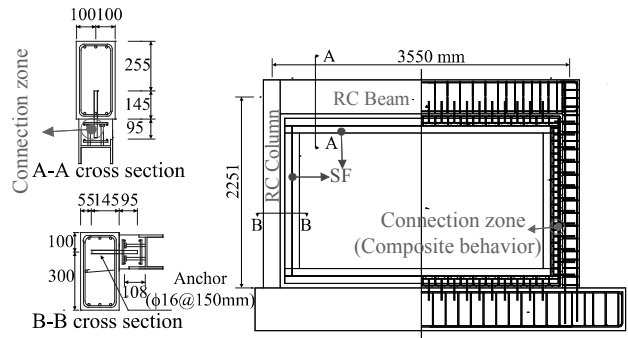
shows the test setup of the RC frame specimen retrofitted with SF only (denoted as the “RS specimen”). Fig. 5b shows the details of the RS specimen and cross-sections of the RC beams and columns. Compressive strength of concrete used (σ_c) is 20 MPa, and the yield strength of the steel rebar is taken to be 420 MPa. A load transfer beam on the top of RC column is connected to the strong floor with high-strength rods. There is a hydraulic cylinder between the transfer beam and the column that applies the compression force on the column. Gravity load from the upper stories and applying a constant vertical load of 250 kN on top of each column, which is equivalent to 15% of the column axial force capacity.
